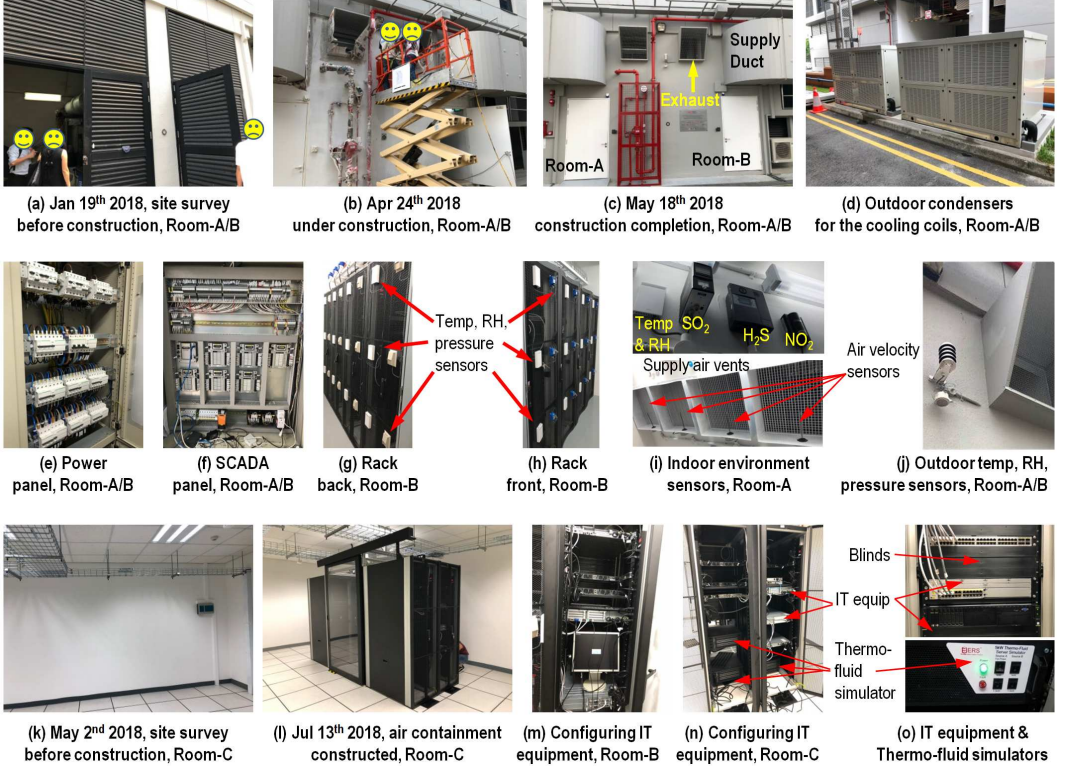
Construction and configuration of Room-A, Room-B, and Room-C.
